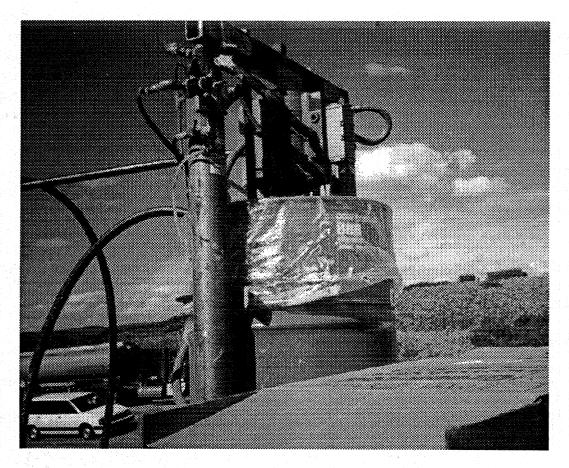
Silicone sealant pumping apparatus used at Heber City, Utah test site.
